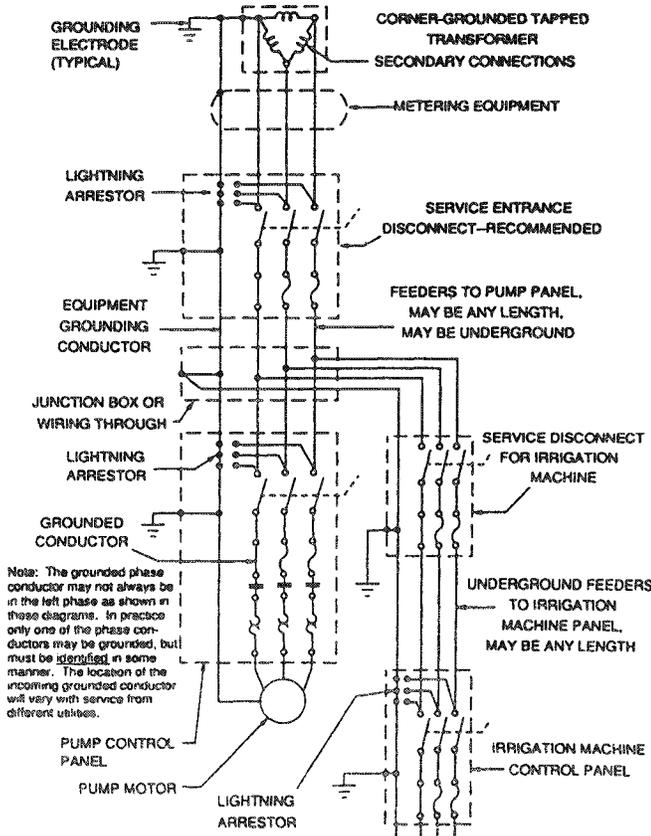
Recommended equipment and grounding for a corner-grounded, delta transformer secondary connections
